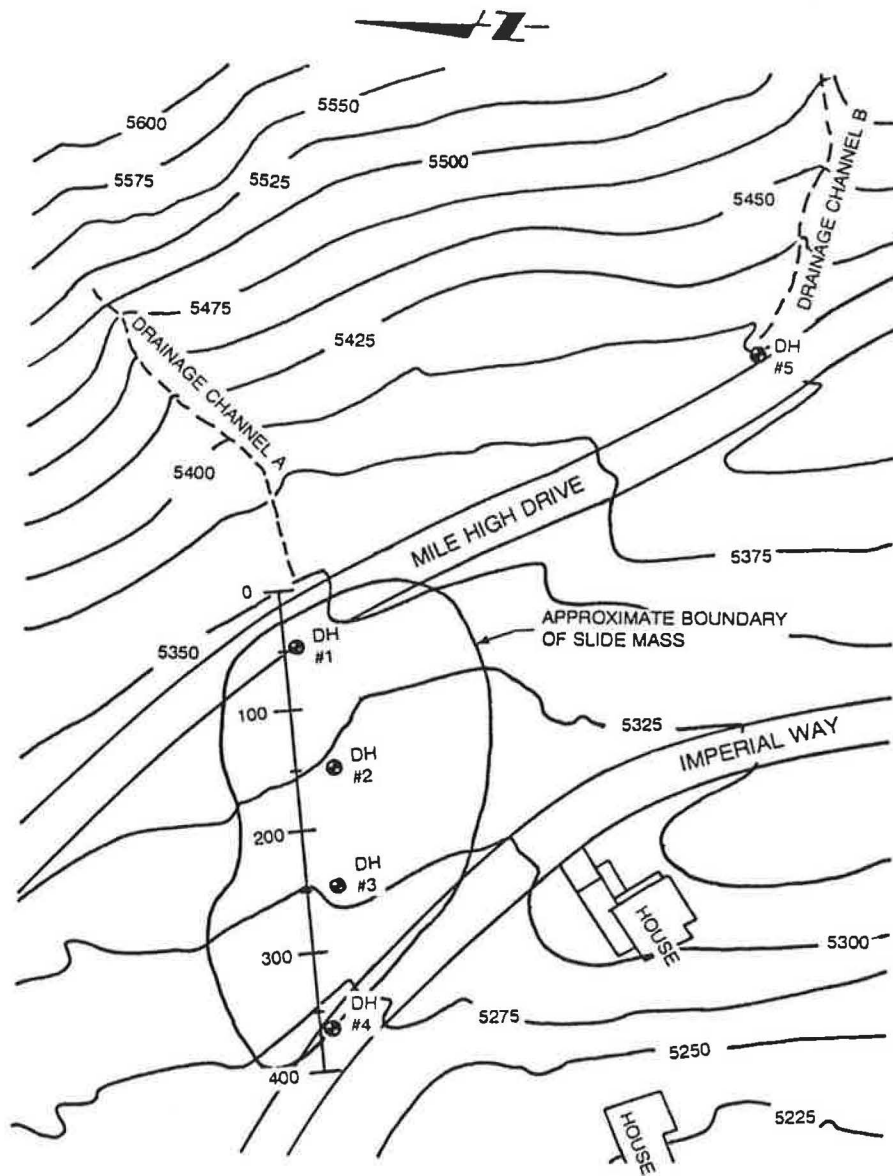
Plan view of Mile High Drive–Imperial Way landslide and drillhole locations.
